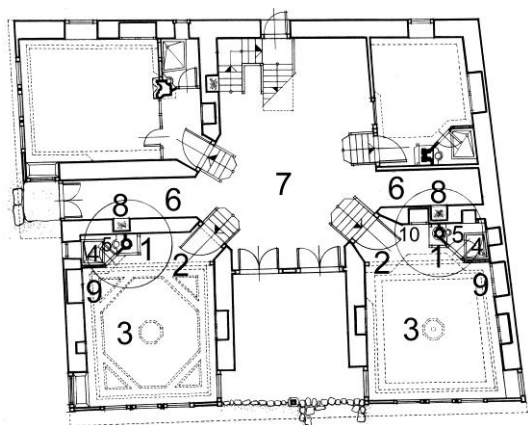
House ground floor plan [H-"SH.B."], built in Prizren
